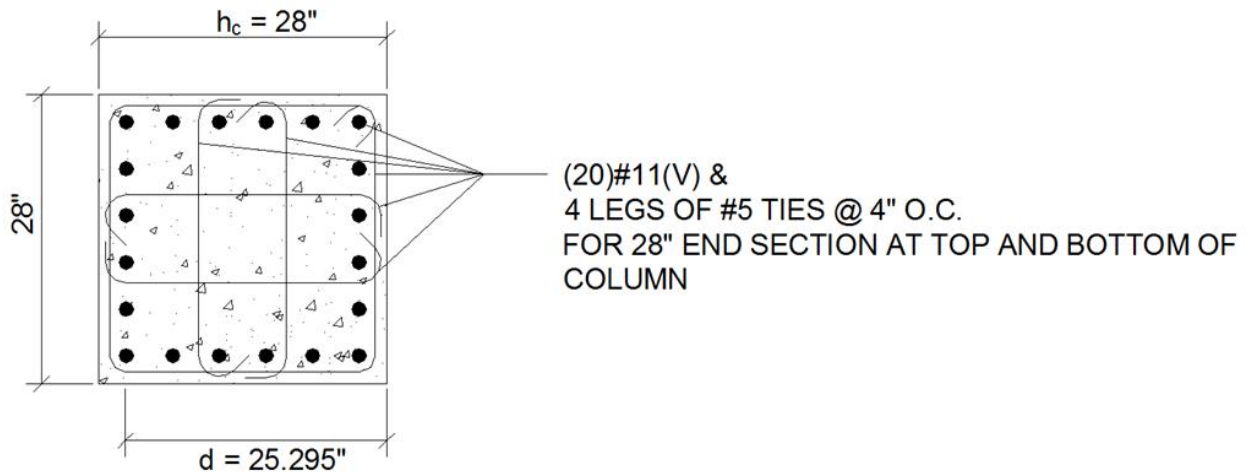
Exterior column, cross-section at end section of column at ground floor level based on tsunami design requirements.
